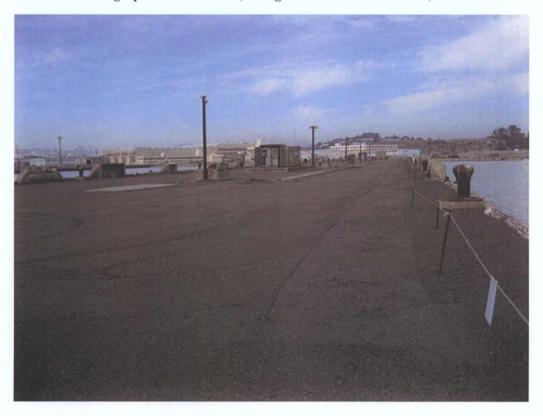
Remaining South Pier wood ties stockpile at Berth 14—November 15, 2012
